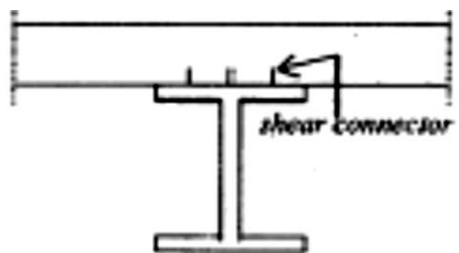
Slabs are Superimposed Steel Beams with a Composite System (Sudarno, 2022)
